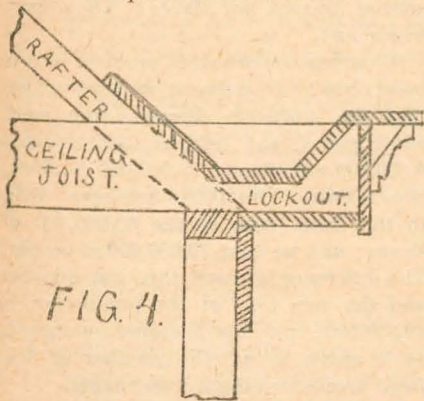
shows a sectional view of another style of cornice and gutter. In this the gutter is formed of four pieces—a bottom, two sides and a piece next to the crown mould, called a fillet. This cornice and gutter is supported by an extension of the ceiling joists past the plate. The portion of the joist extending past the plate is frequently termed the look-out. The pitch of the gutter is obtained by gradually cutting the lookouts deeper towards the outlet.
